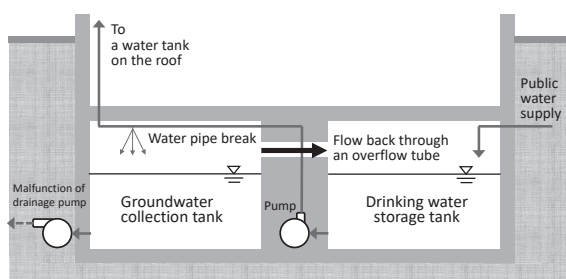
The water supply system in the commercial building. The drinking water storage and groundwater collection tanks were made of concrete and placed at the basement as part of the building.
